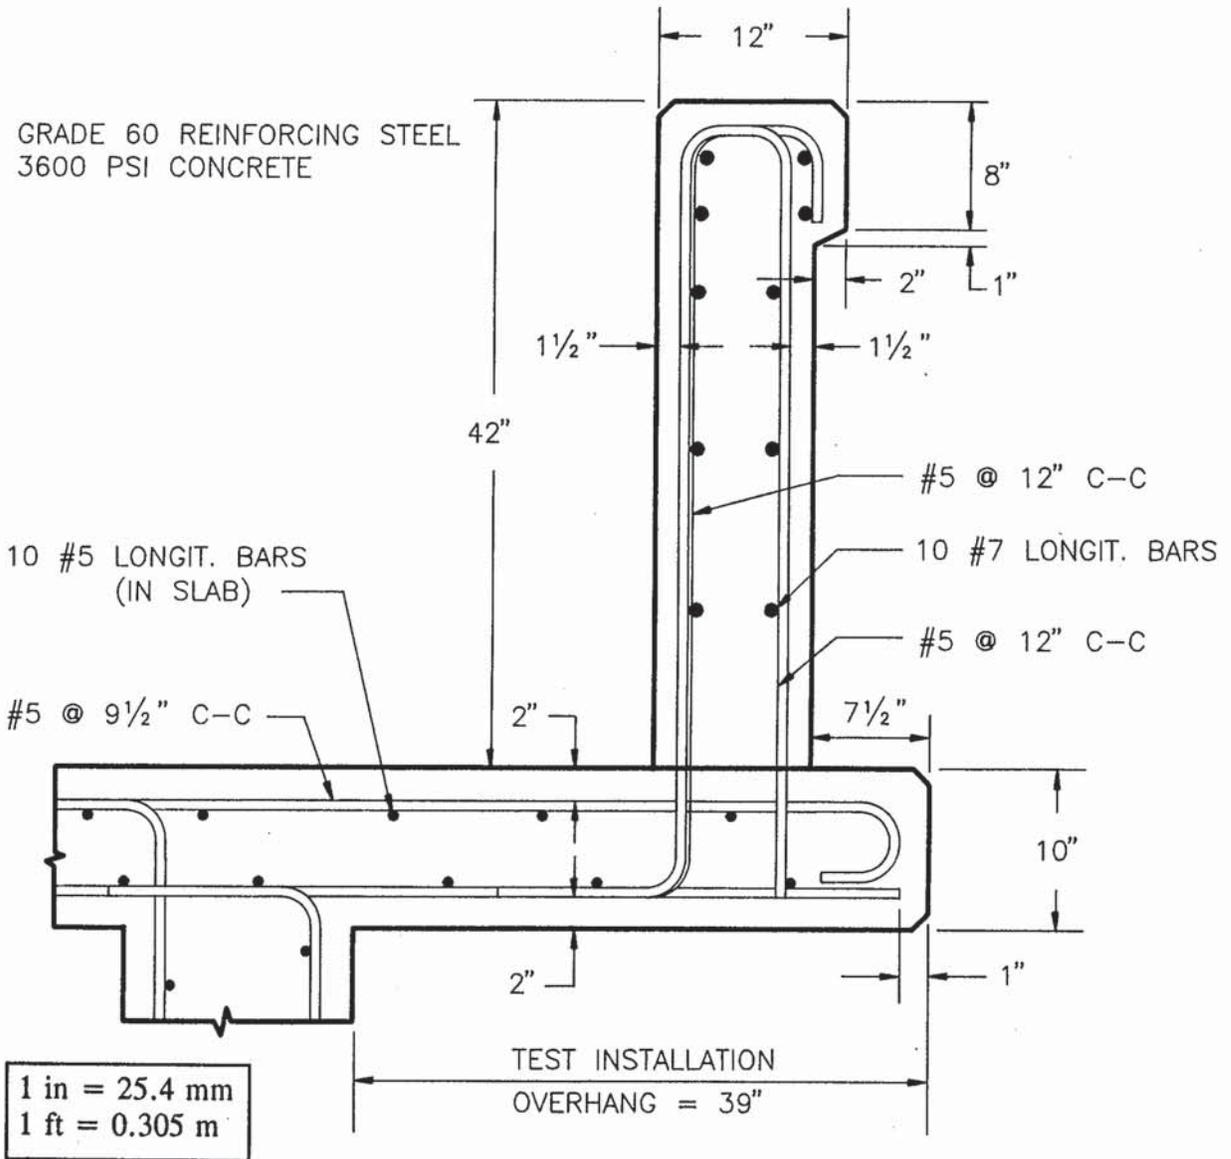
42-in (1.07-m) Vertical Concrete Parapet (8,64,65,15).
